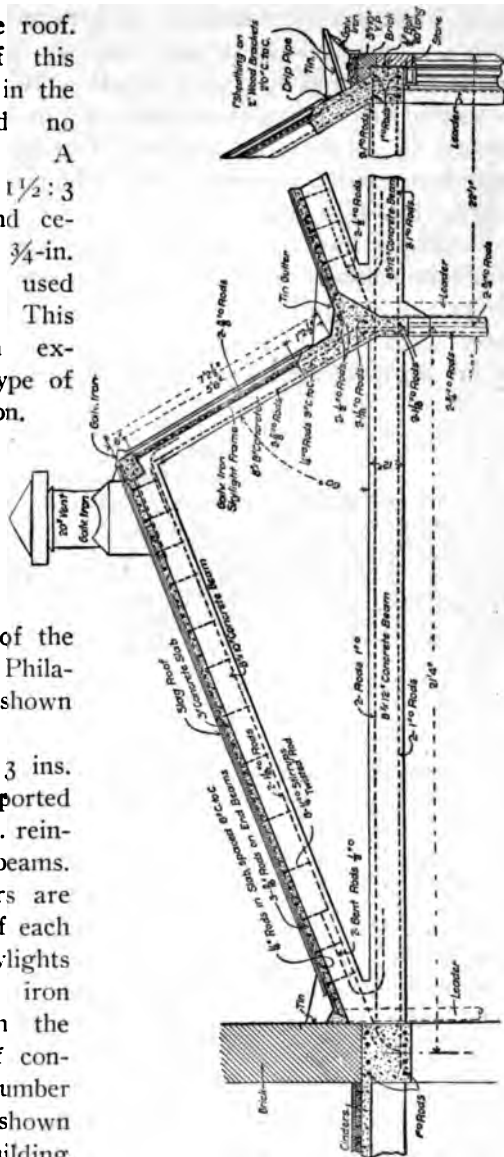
Saw Tooth Roof, Bilgram Machine Shop.
